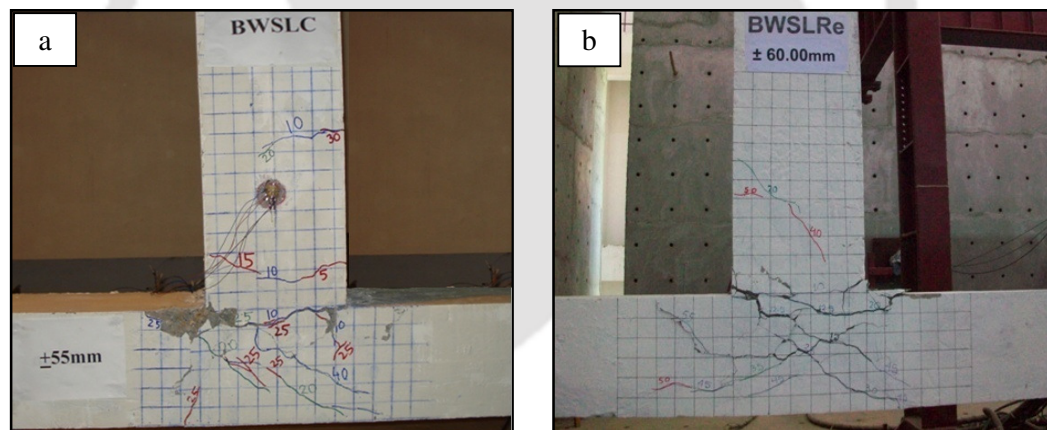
BWSL specimens at the end of test under loading type-1:
